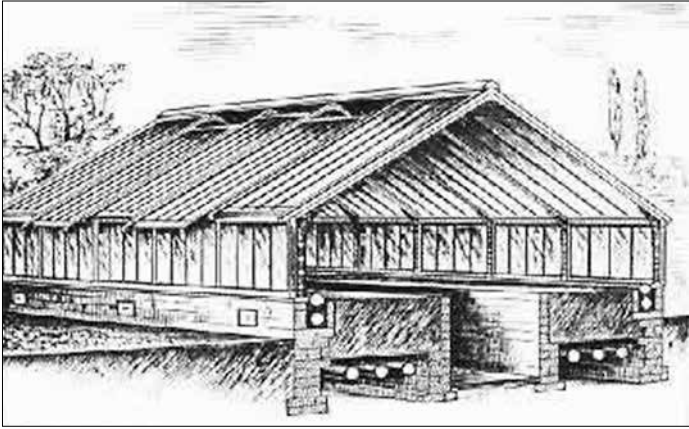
Groundheating system in a hot-house. Picture by Mike Gilmore (2016) from “Winsford Walled Garden.”
